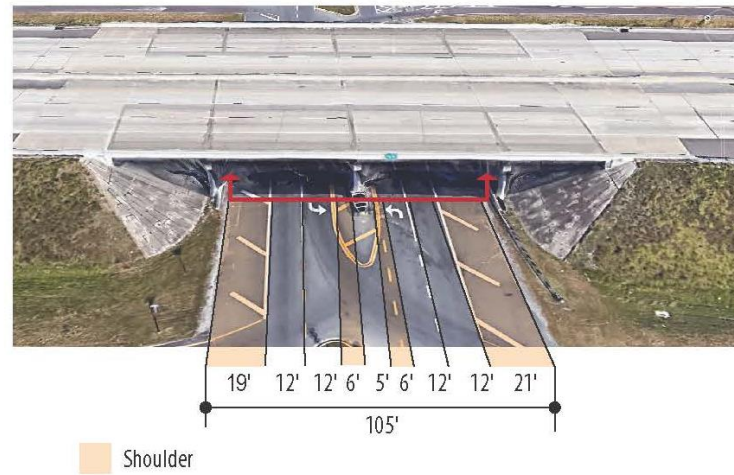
(continued): Existing S.R. 524 Roadway Cross Sections: Friday Road South to Cox Rd.
